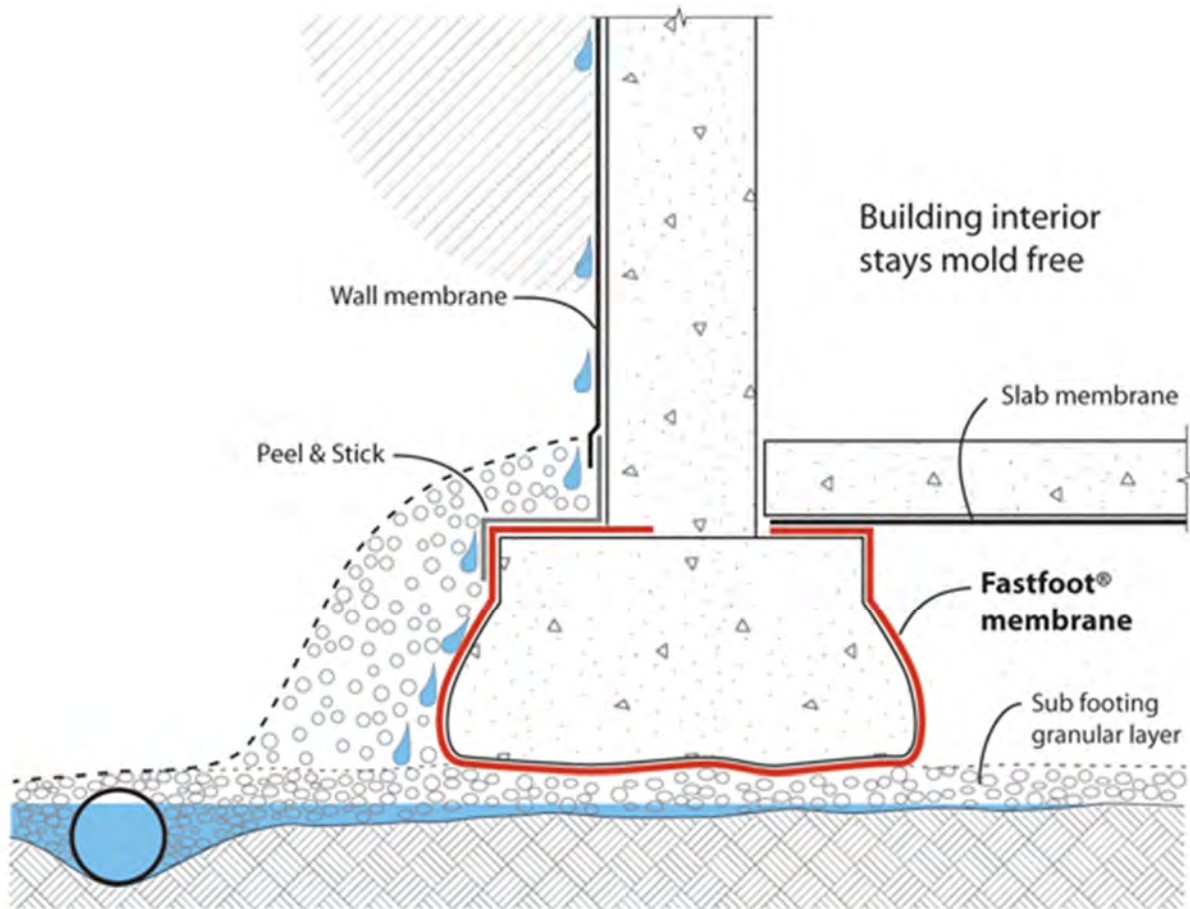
Preventing Rising Damp Using Fastfoot formwork
